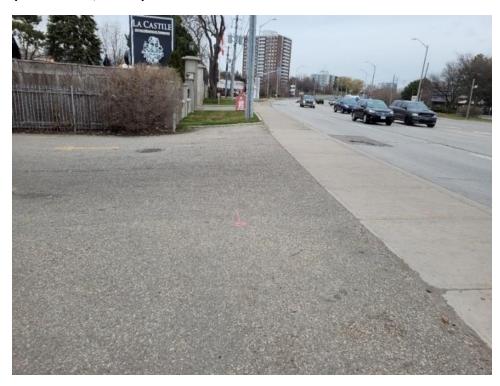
Typical ROW disturbance, modern development and grading, facing northwest (March 31, 2021)
